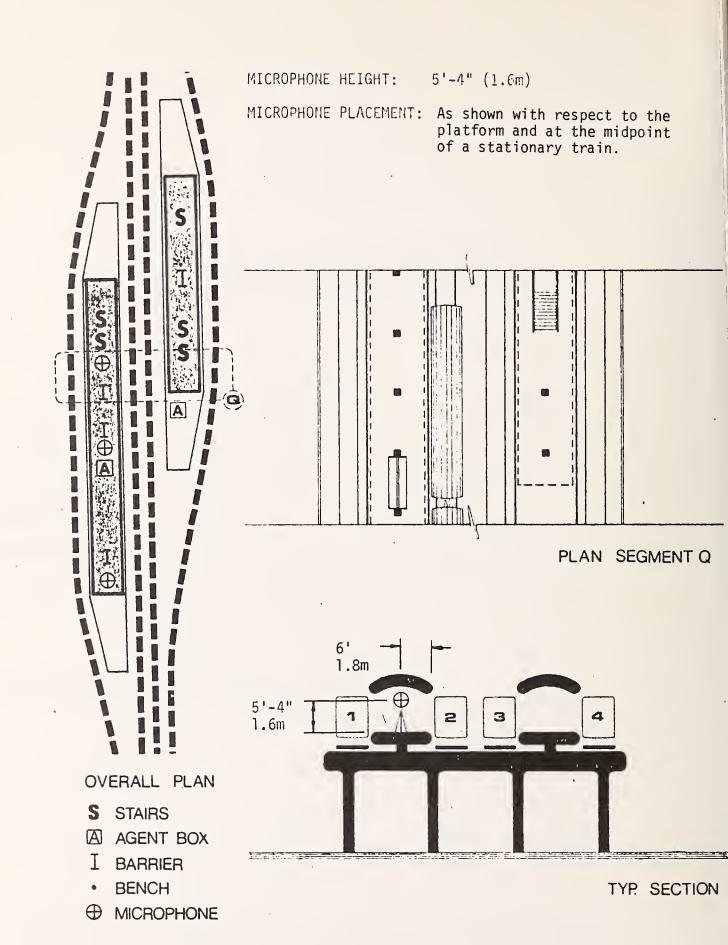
Center Platform Elevated Steel Station Configuration (Station Type 1)
